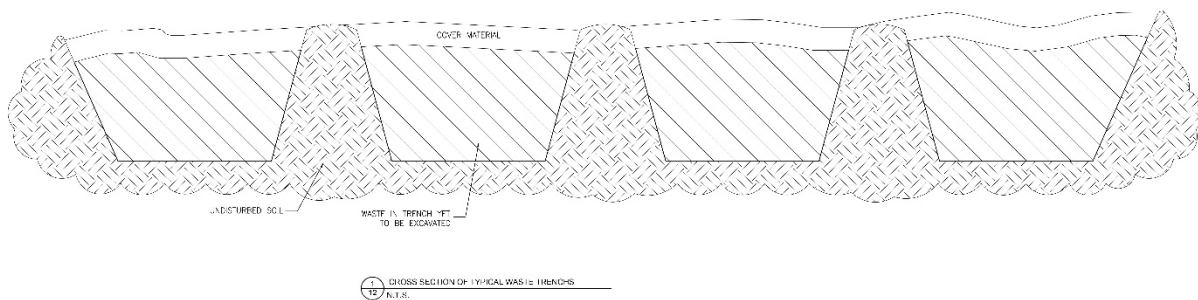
Typical Trench Cell Cross Section (See Also Appendix A-3)
